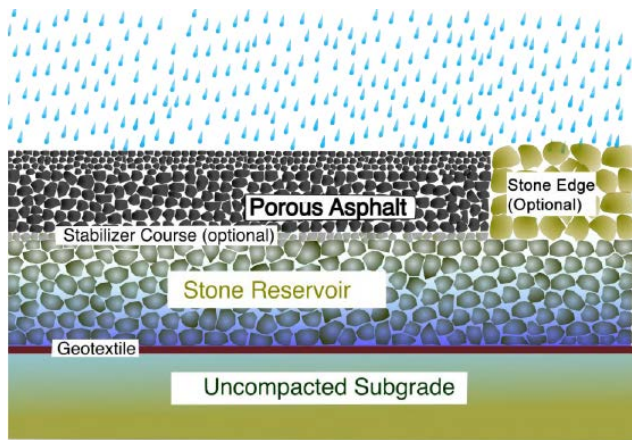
Typical porous pavement with stone reservoir cross-section (Not to scale) (Dylla & Hansen, 2015)
